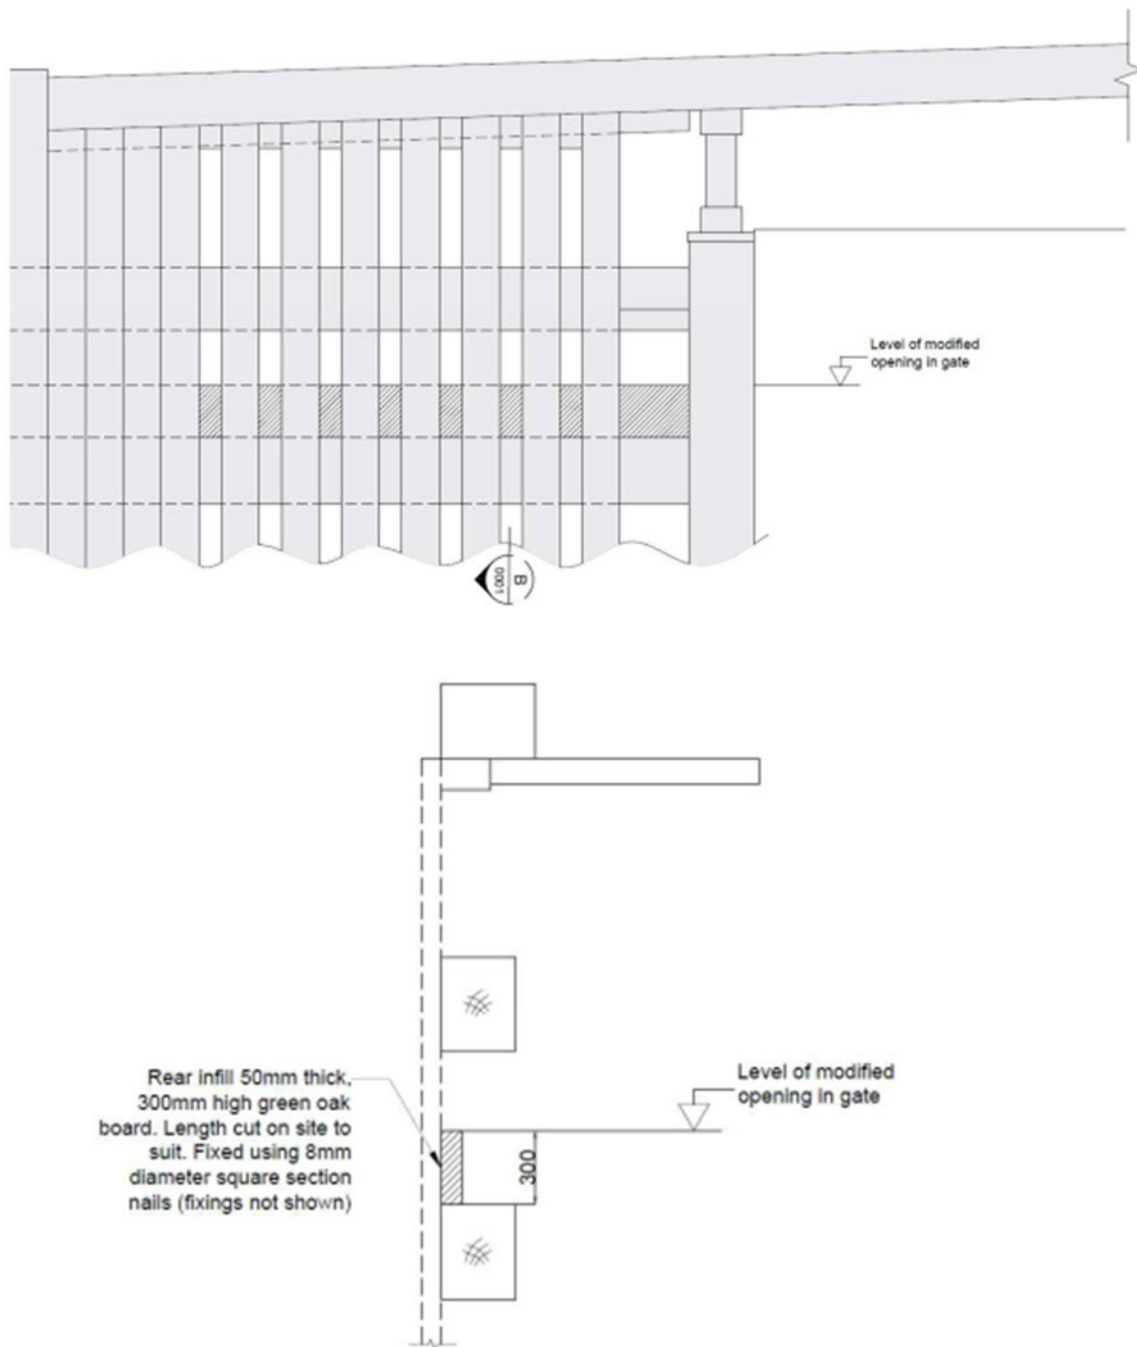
Elevation and cross section of the proposed modification to the top lock gates (Arcadis 2022).
